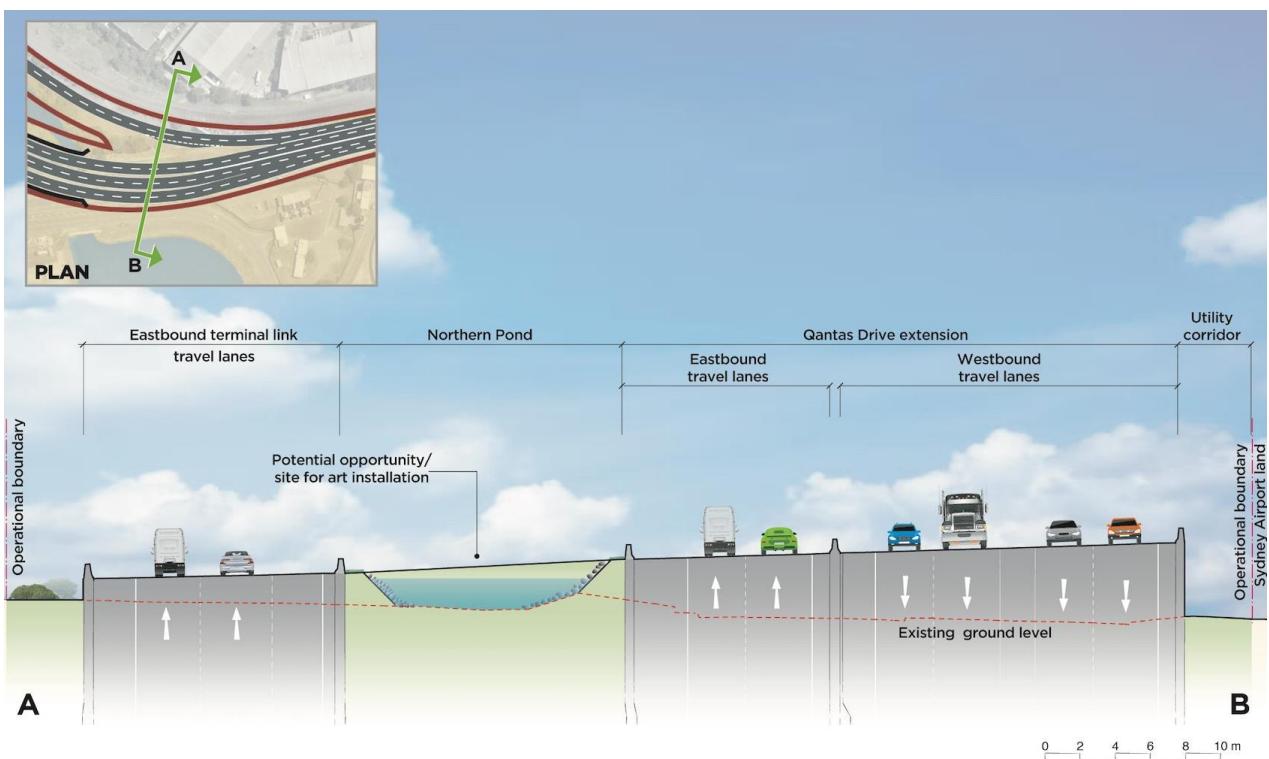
Qantas Drive upgrade and extension east of Alexandra Canal – typical cross-section (looking south)
